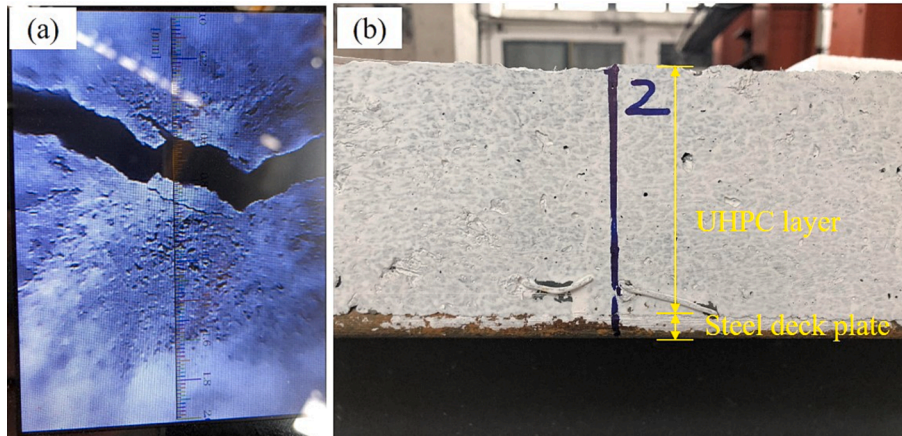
Instrumentation of specimen: (a) crack observer; (b) The marked interface at 2-N.
